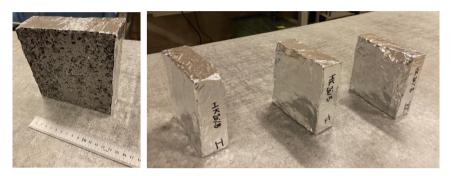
Examples of specimens sealed with aluminum tape on all but one surface.
